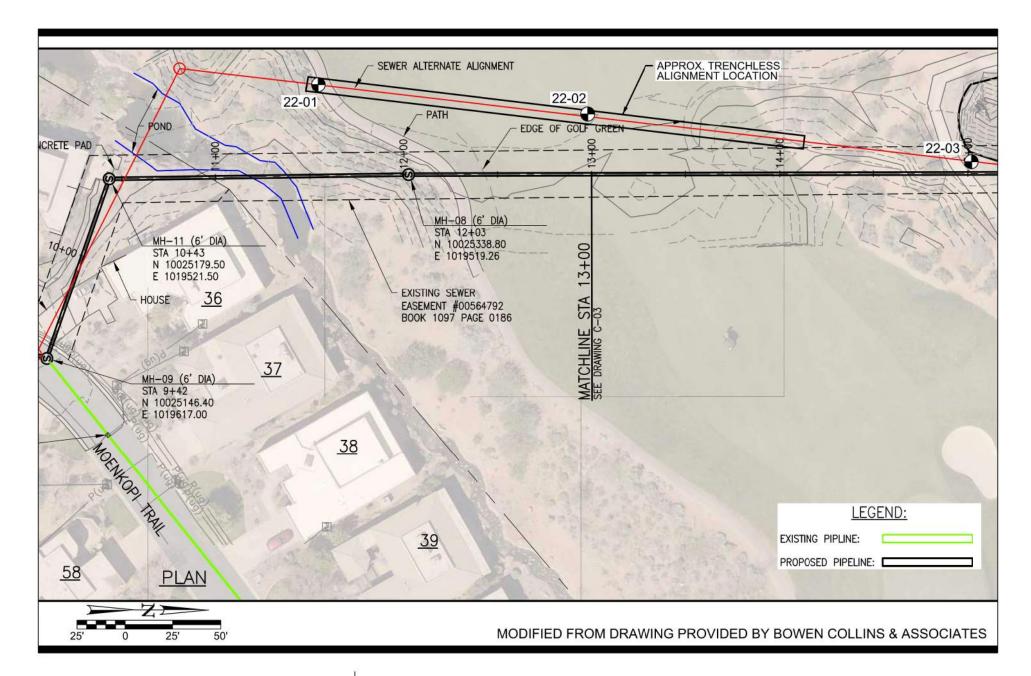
SITE PLAN & TEST HOLE LOCATIONS
